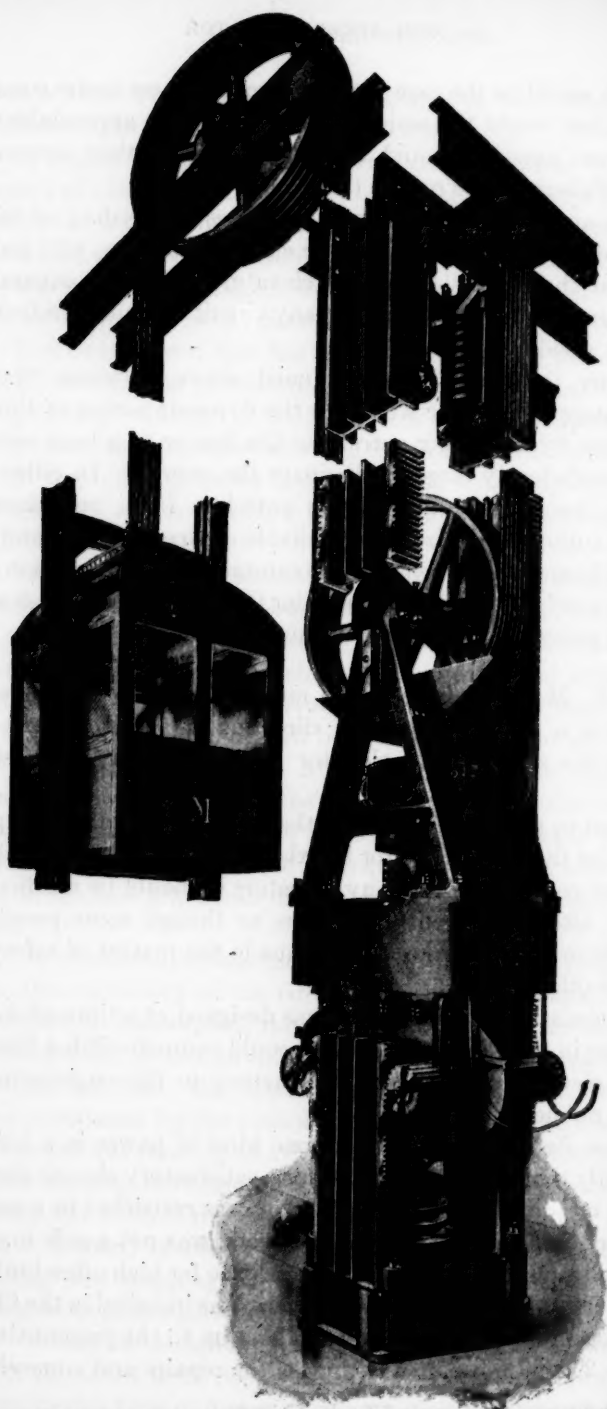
ELEVATOR FOR CHICAGO BOARD OF TRADE BUILDING
